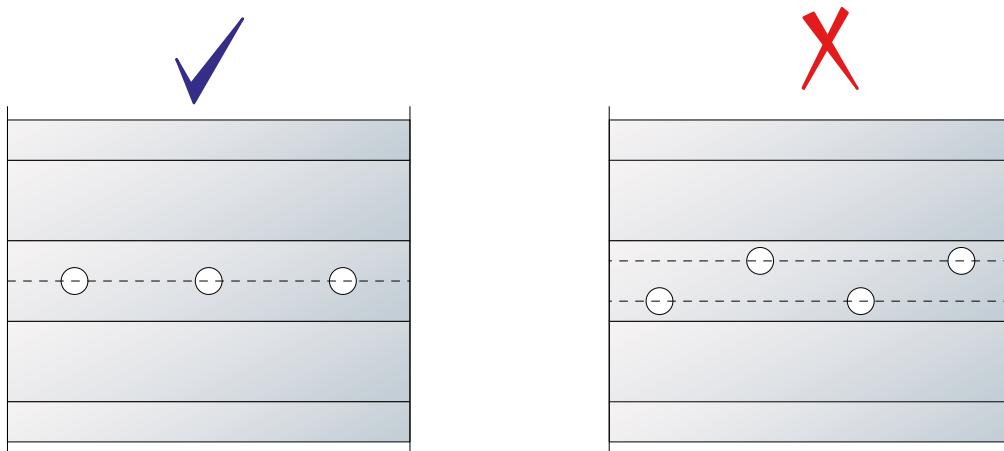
Horizontal and vertical wall panels penetration positioning and sizing detail
